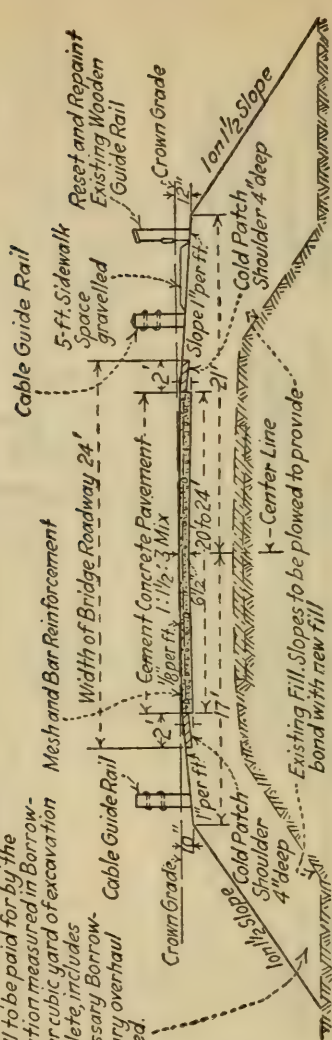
B.—Typical subway road sections pedestrian traffic rural districts.
